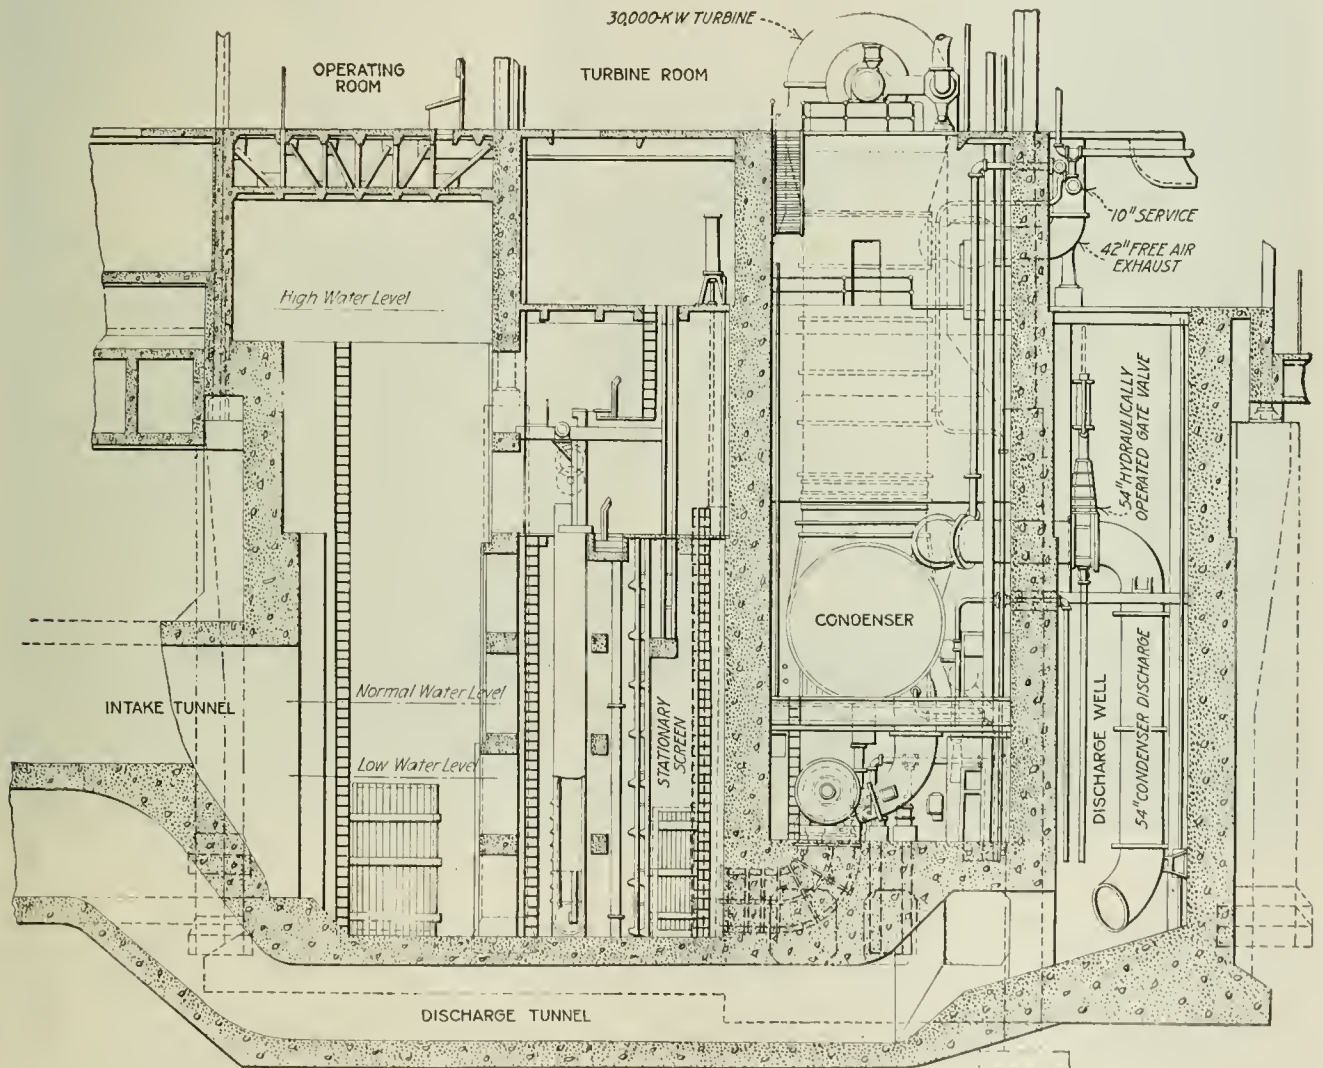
ELEVATION OF THE INTAKE WELL AND CONDENSER PIT
